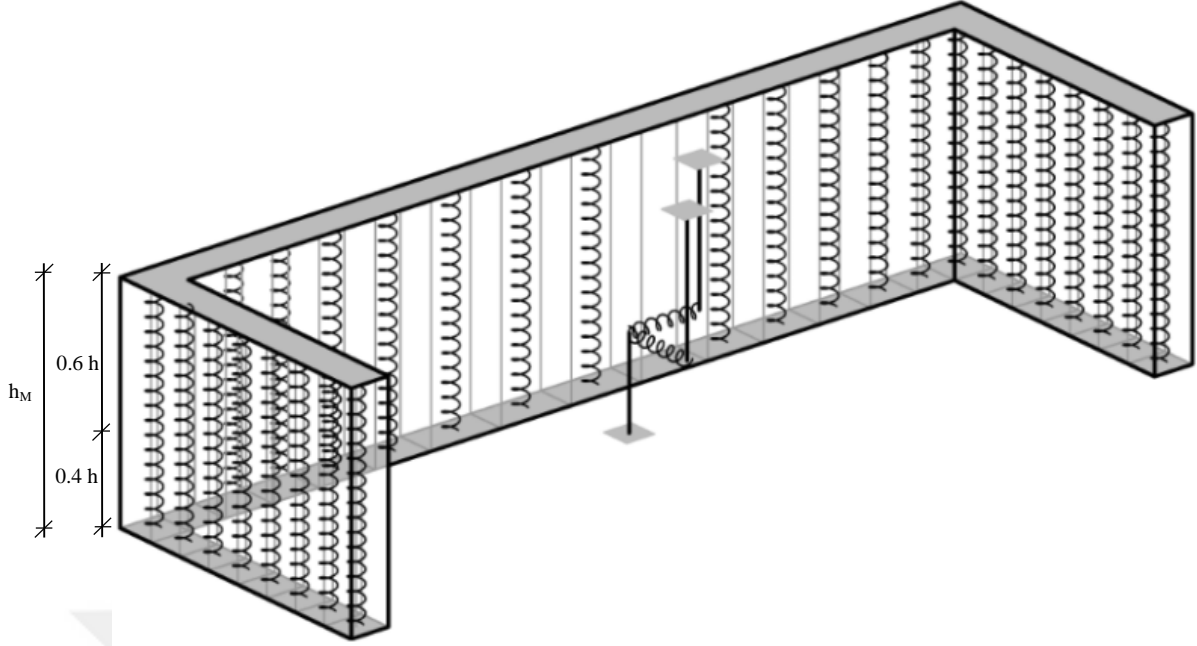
3D MVLEM for a U-shaped shear wall example.
